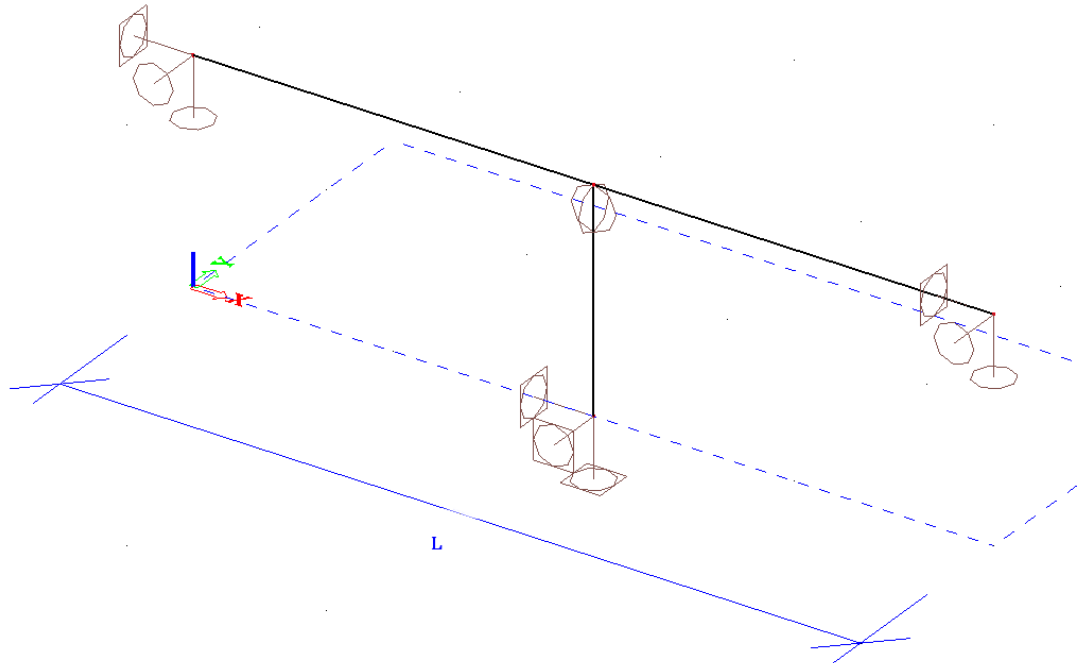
One-sided frame with horizontal beam and one vertical column.
